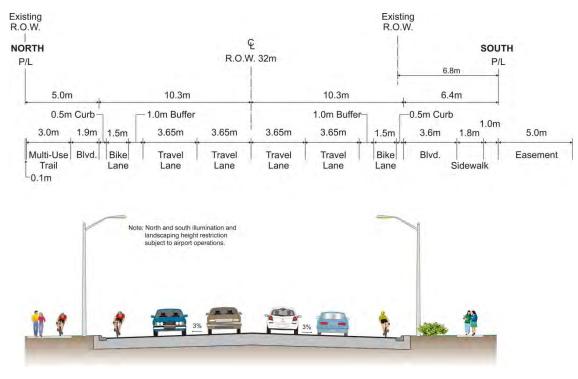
PIC 2 TYPICAL CROSS-SECTION COUNTY ROAD 42 WALKER ROAD TO 7th CONCESSION ROAD
